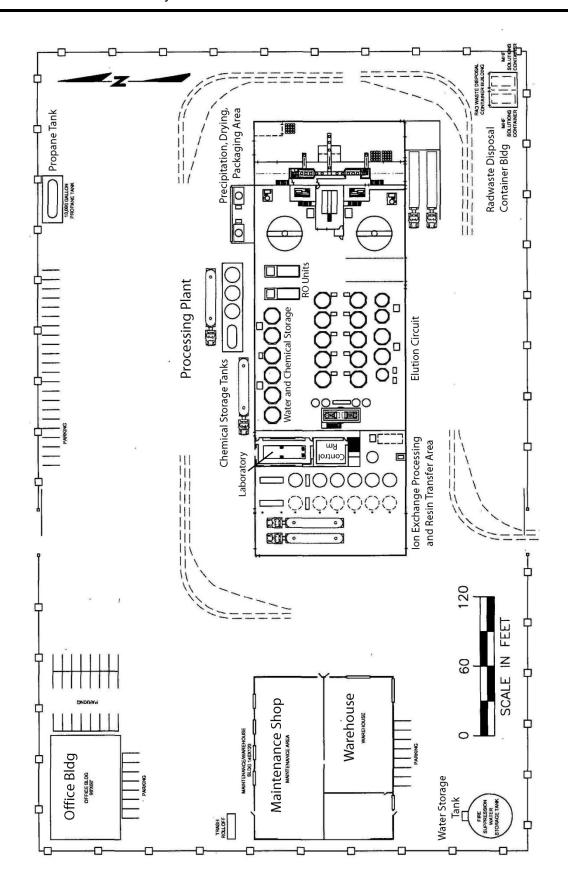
General Site Plan for the Burdock Central Processing Plant. Source: Modified From Powertech (2009b).
